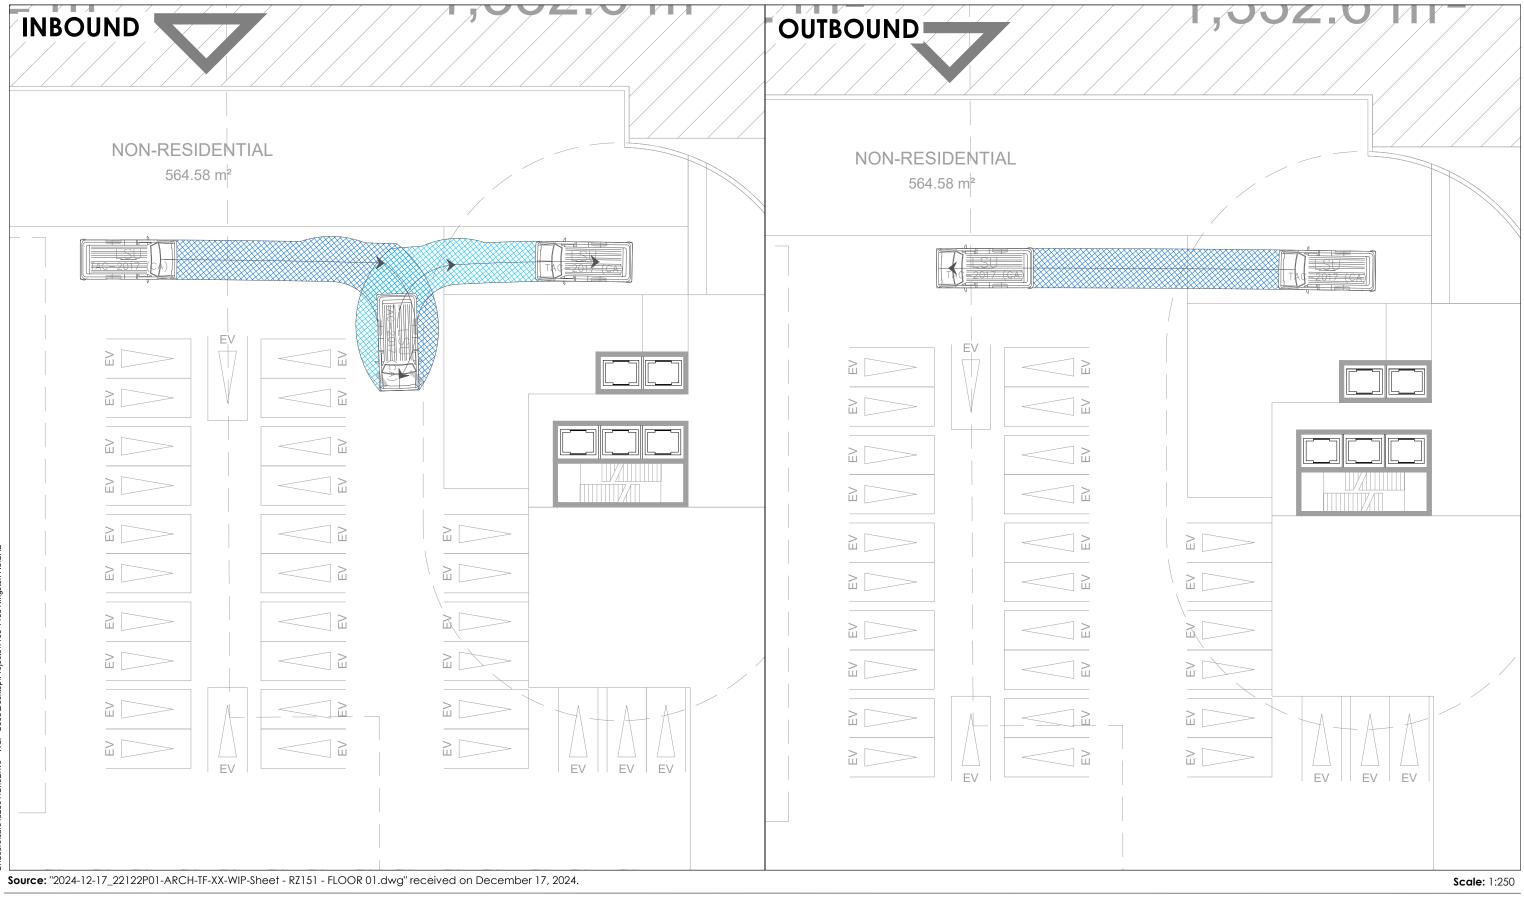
LSU Loading Truck Turning Maneuver - Building B - Loading Space 2 1105-1163 Kingston Road, Pickering
